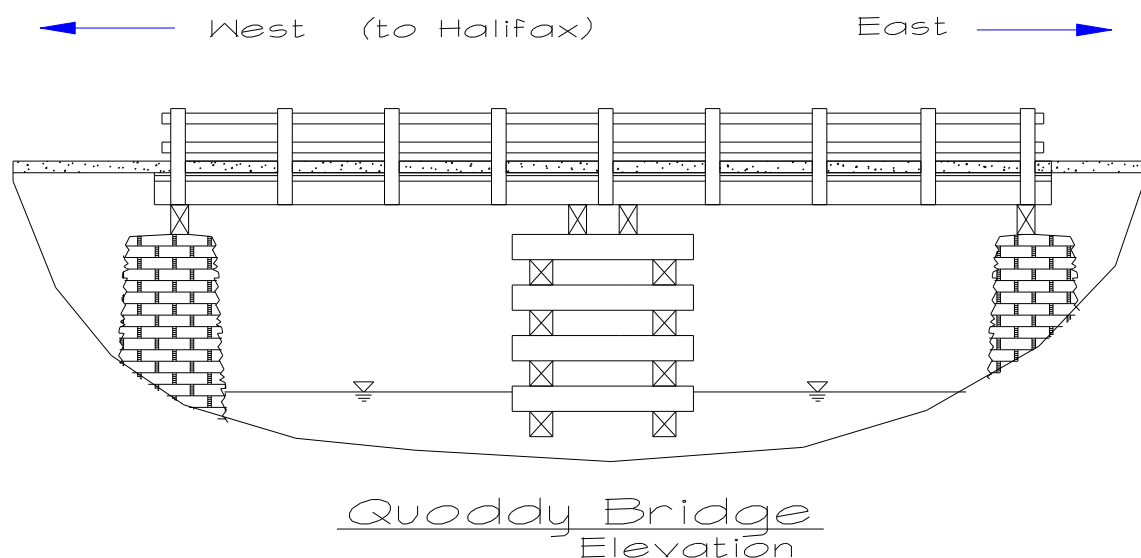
Quoddy Bay bridge elevation showing east-west directions.
